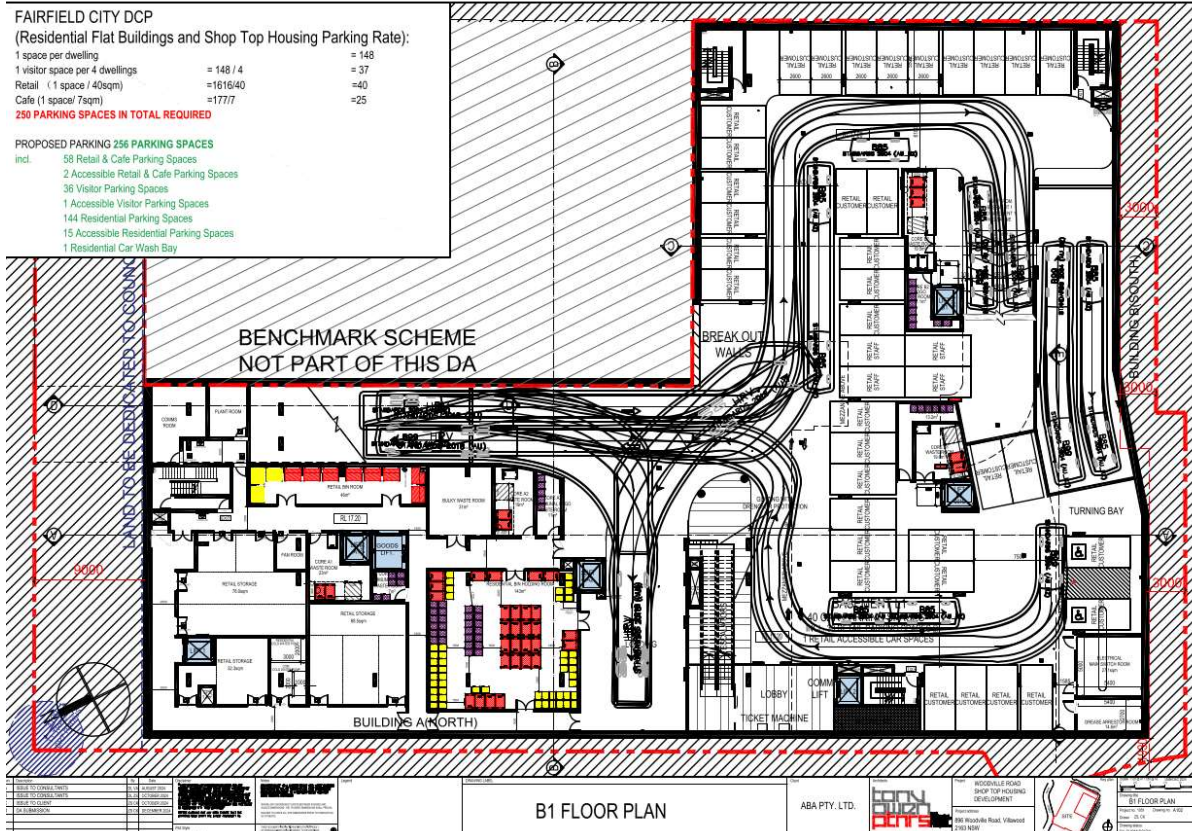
Proposed Basement 1 out of 3-4 basement levels, being the retail level, also illustrating break out wall to facilitate future redevelopment of neighbouring site.
